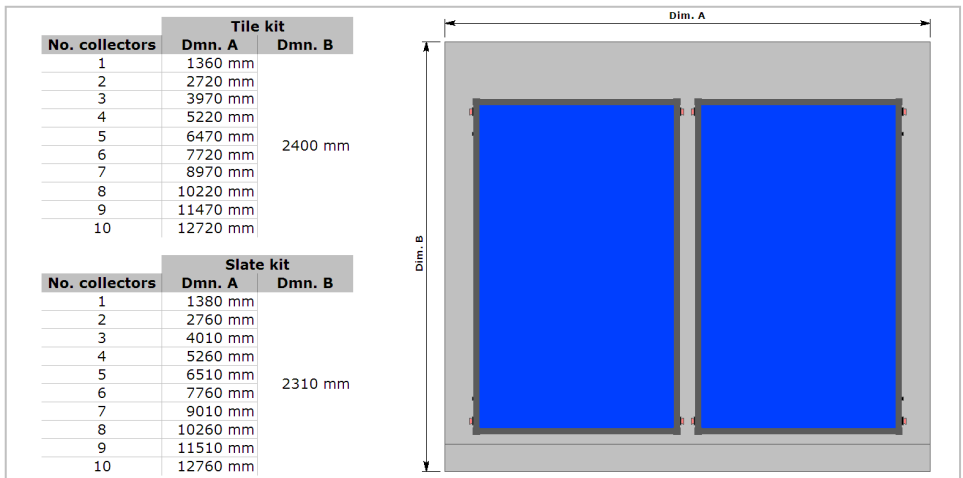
Space requirement Dimplex SOLC200 in roof installation
